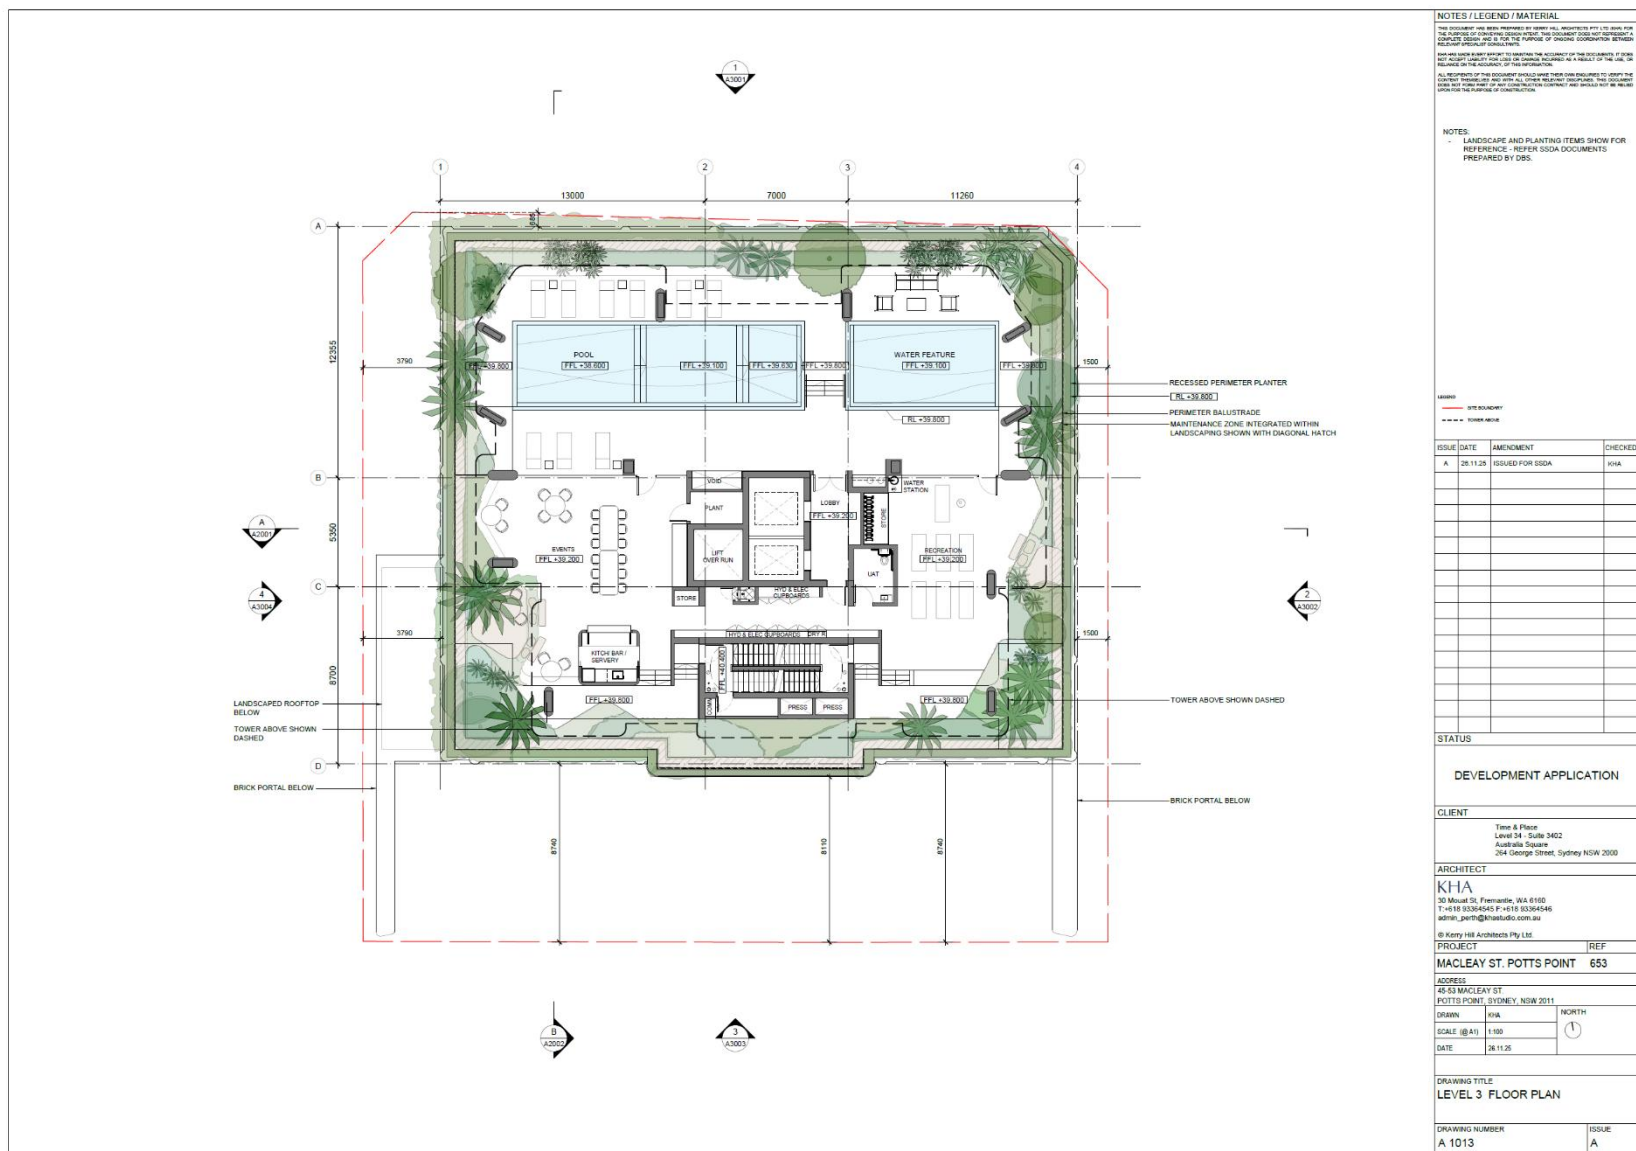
Level 3 floor plan (Kerry Hill Architects)
